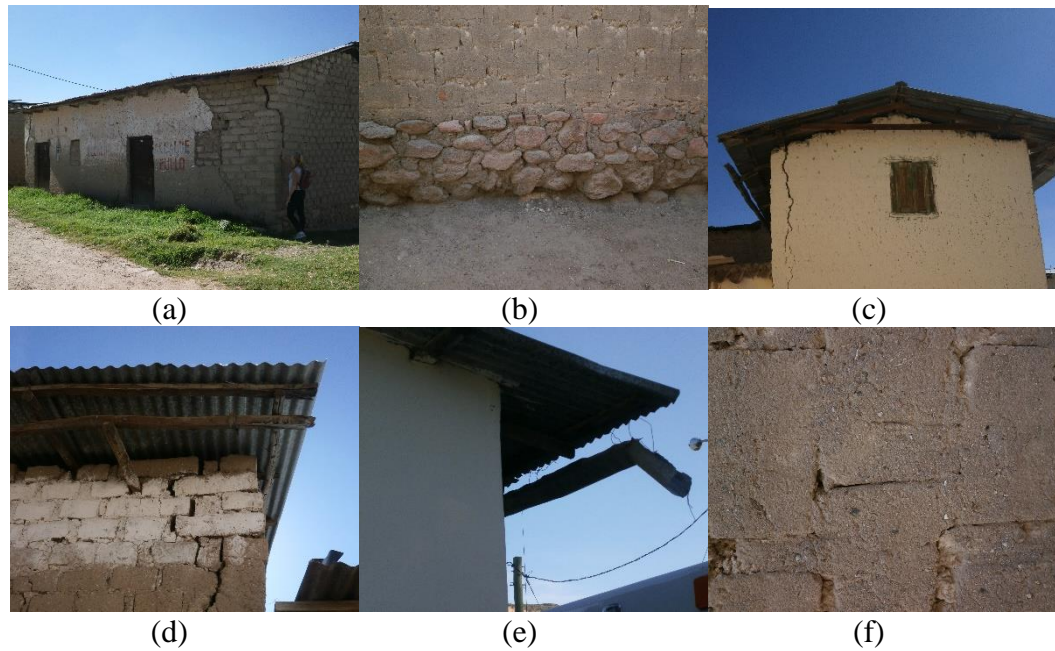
(a) Two stories house with a pitched roof, (b) drywall foundation, (c) ceiling of wood resting directly on house walls, (d) Typical roof material, (e) water draining, (f) brick joints filled with mortar.
